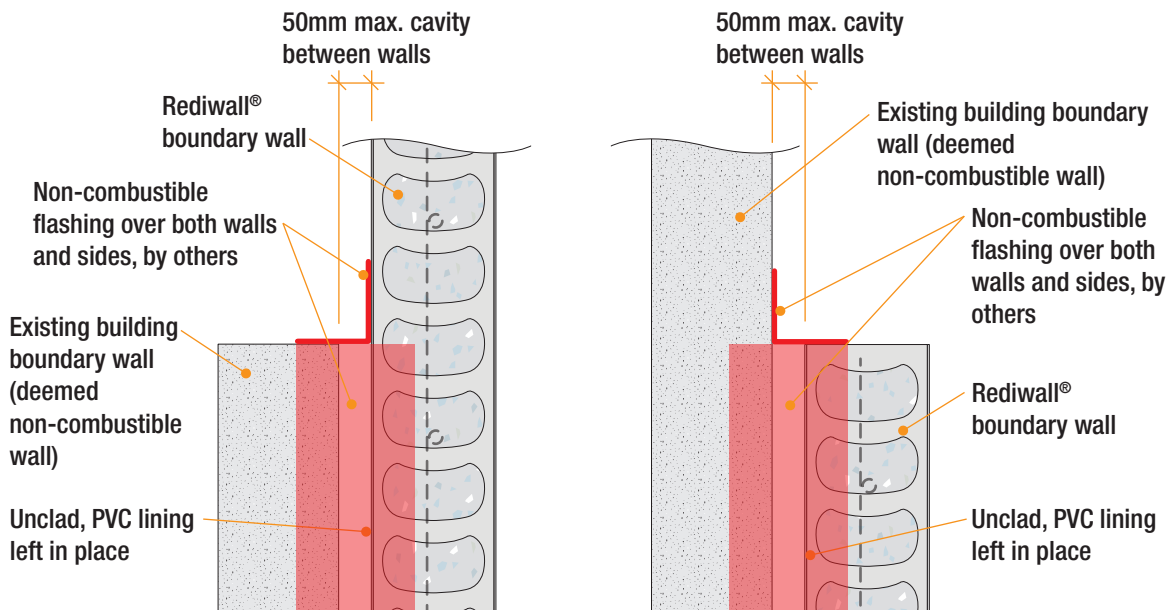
Rediwall® Boundary Wall with Different Wall Heights
